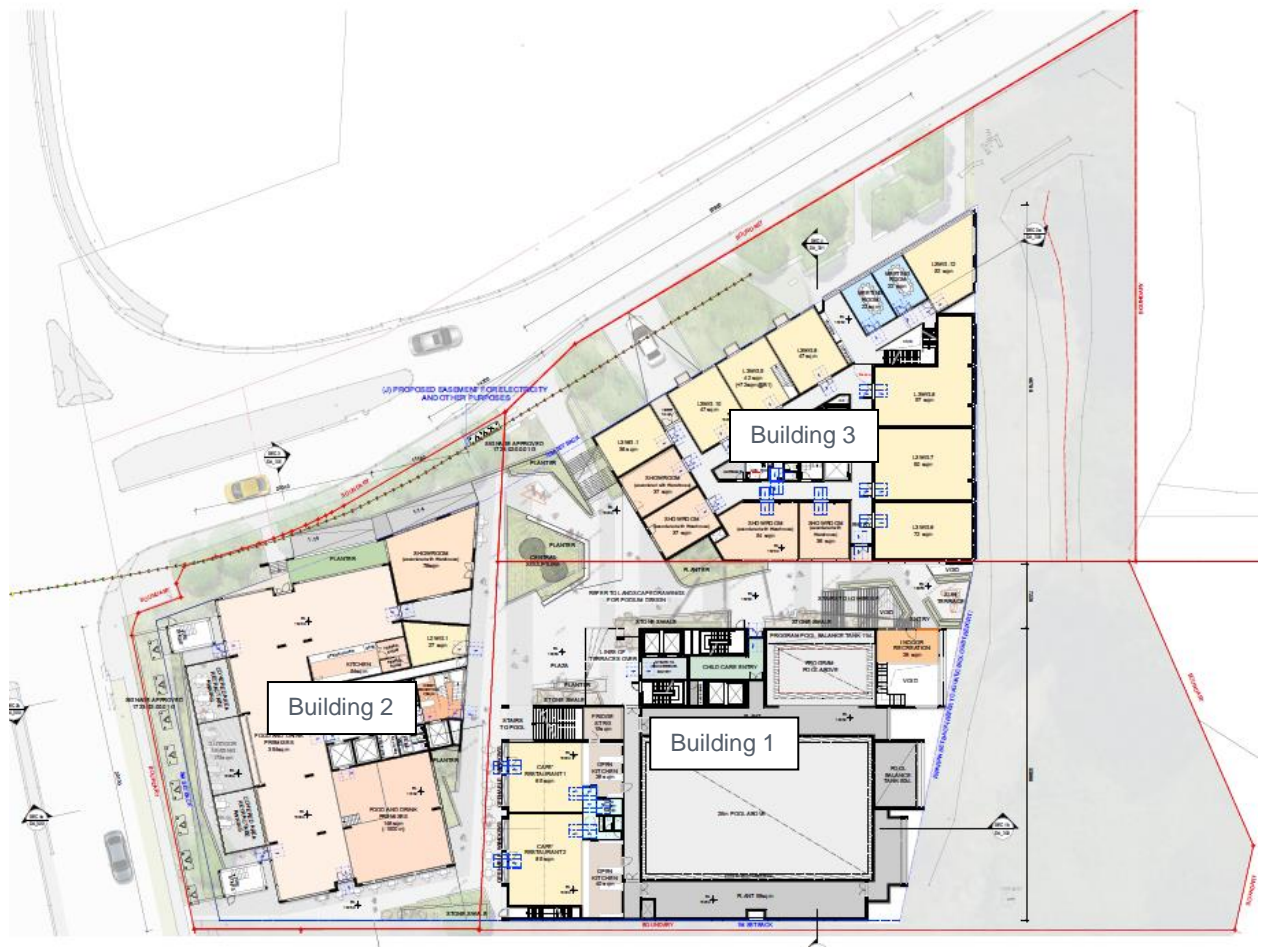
Ground floor plan indicating the arrangement of the three buildings on the site
